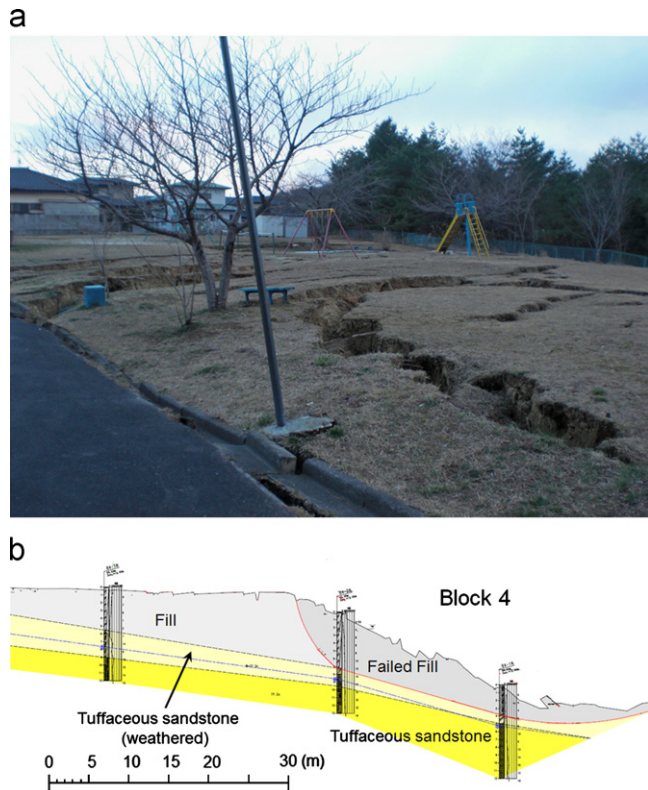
(a) Extensional cracks at park located on crest of failed slope in Block 4 (failure was toward right of photo) and (b) cross-sectional profile of failed slope in Block 4.
